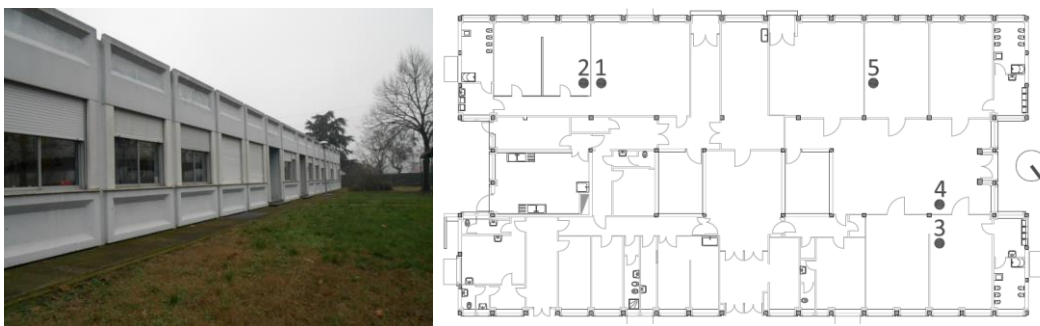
(left) Picture of the southwest façade; (right) kindergarten plan view including the five monitored rooms.
